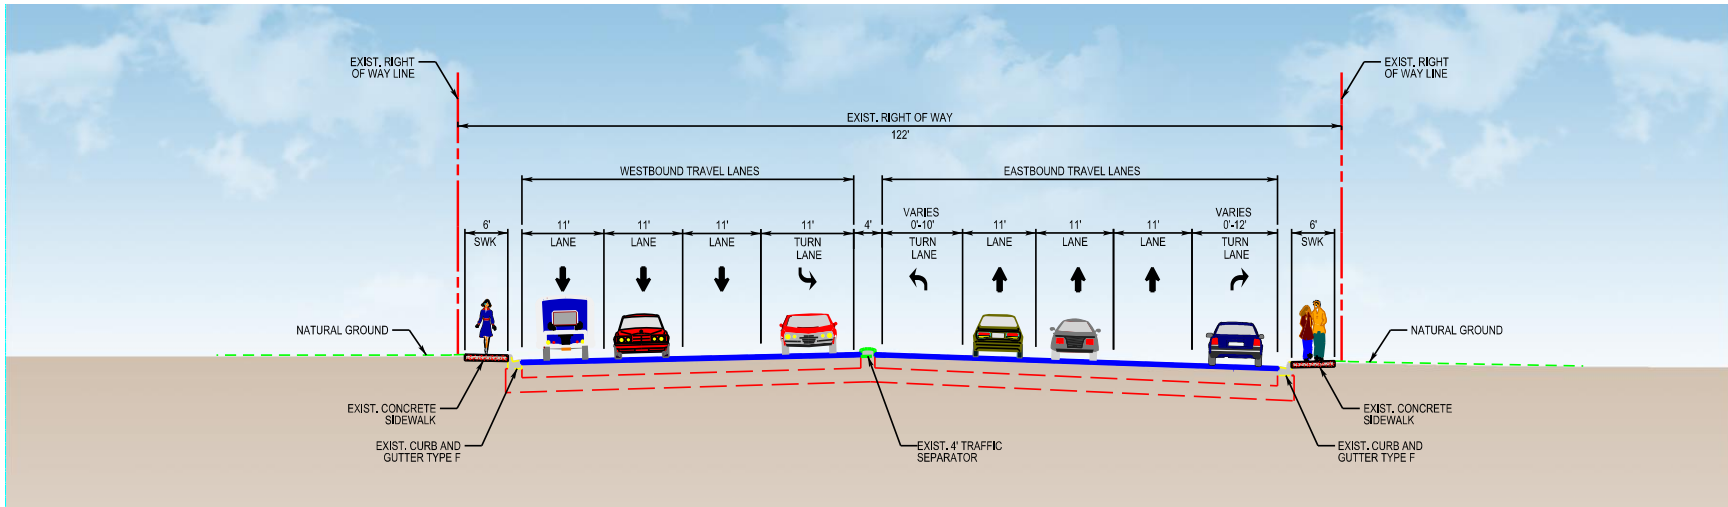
Lantana Road from High Ridge Road to Sunset Road
